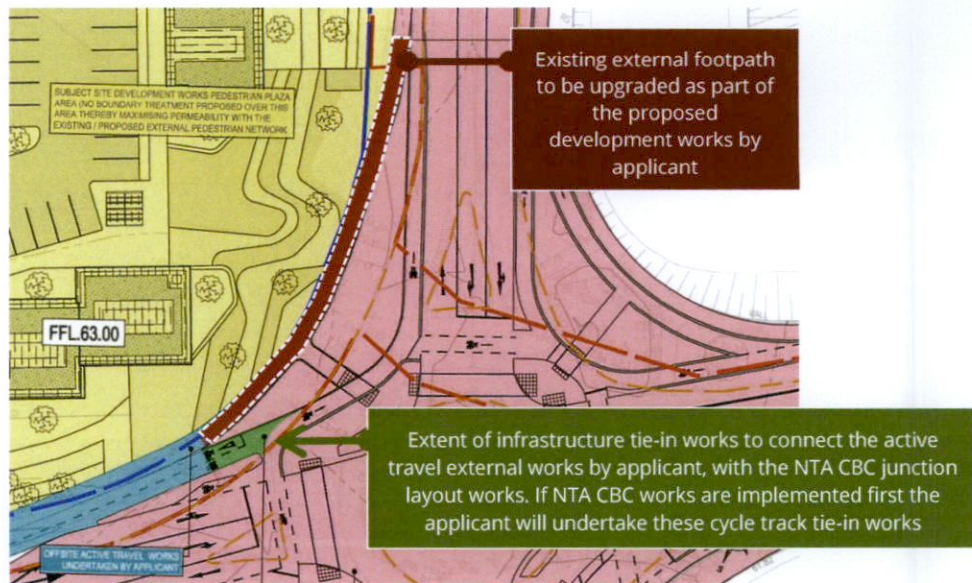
Upgrade of Existing External Public Footpath by Applicant Adjoining Plaza Area
